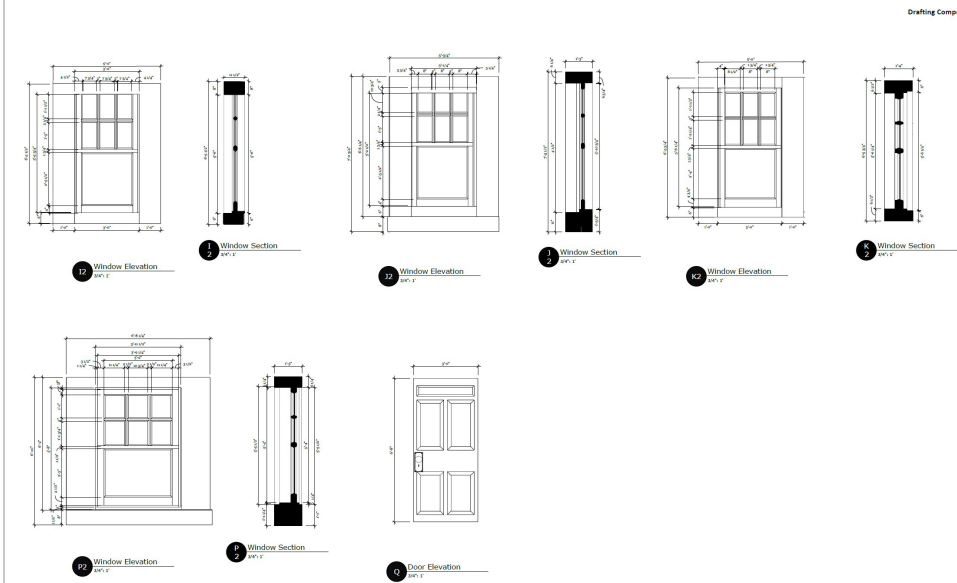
Henning's Sporting Goods, Interior and Exterior Wall Details Drafting, SketchUp & Layout, Zach Zahn, 2022
